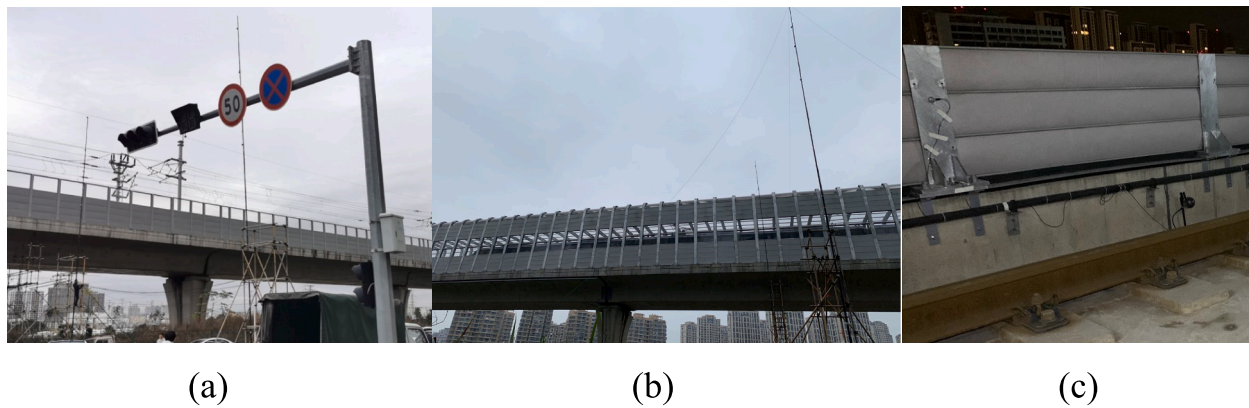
Site conditions of (a) straight barrier section, (b) semi-closed barrier section for unmodified test section, and (c) track-side barrier at controlled test section.
